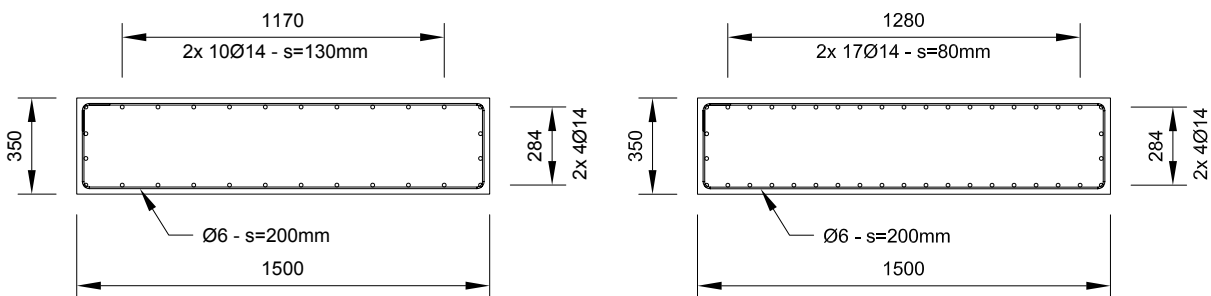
Pier cross-section with reinforcement layout (all dimensions in mm)
